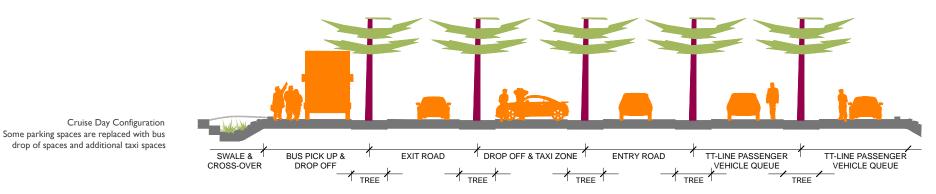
| Indicative cross section through Pier Park space showing passenger drop off
